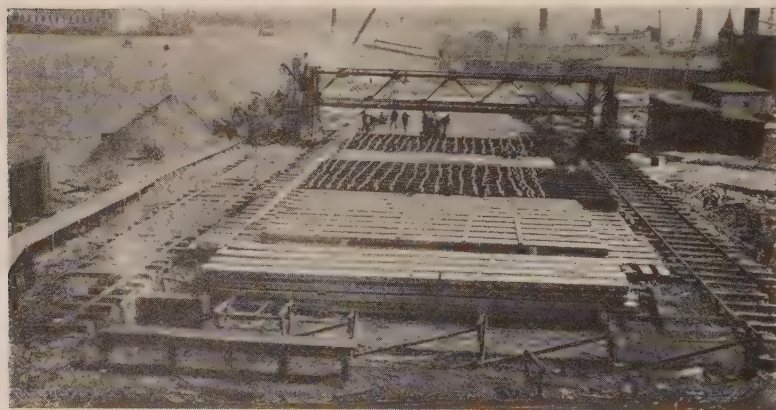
CASTING YARD FOR CONCRETE PILES.
